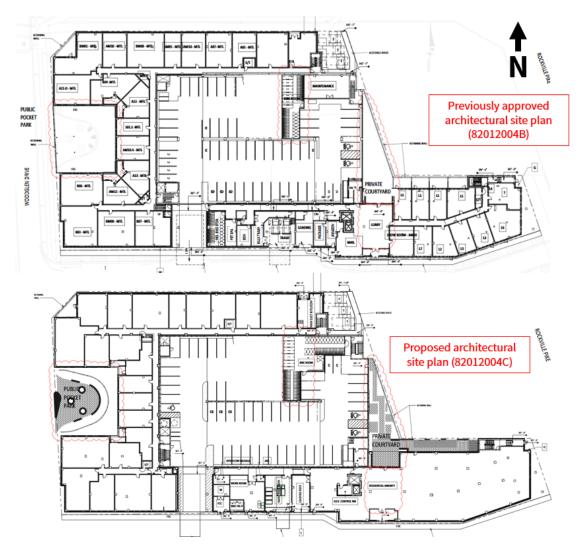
Previously Approved and Currently Proposed Architectural Site Plan
